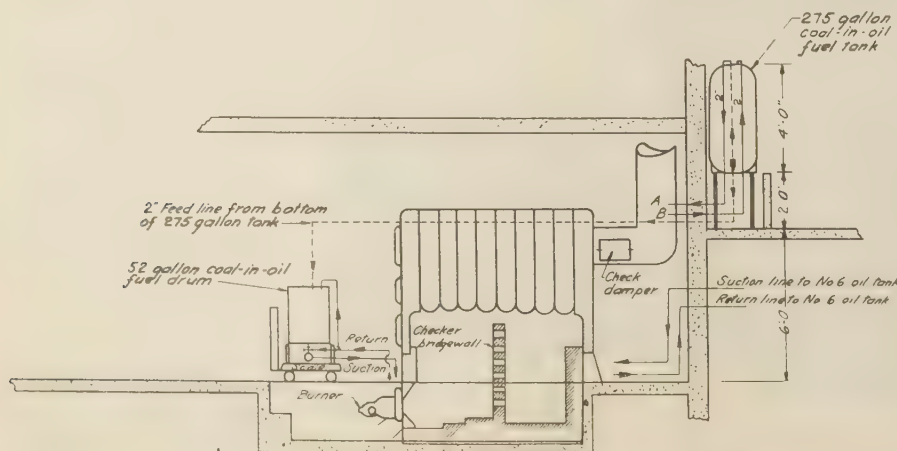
GENERAL LAYOUT OF TEST SETUP AT HEATING PLANT OF NATIONAL AIROIL BURNER COMPANY
